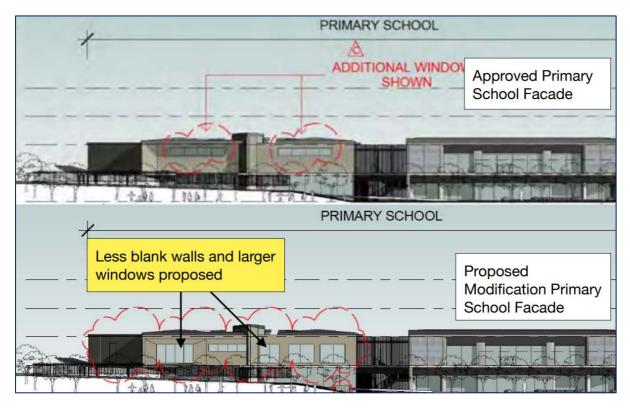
| Proposed modifications – southern facade (Source: Applicant's Modification Report)
